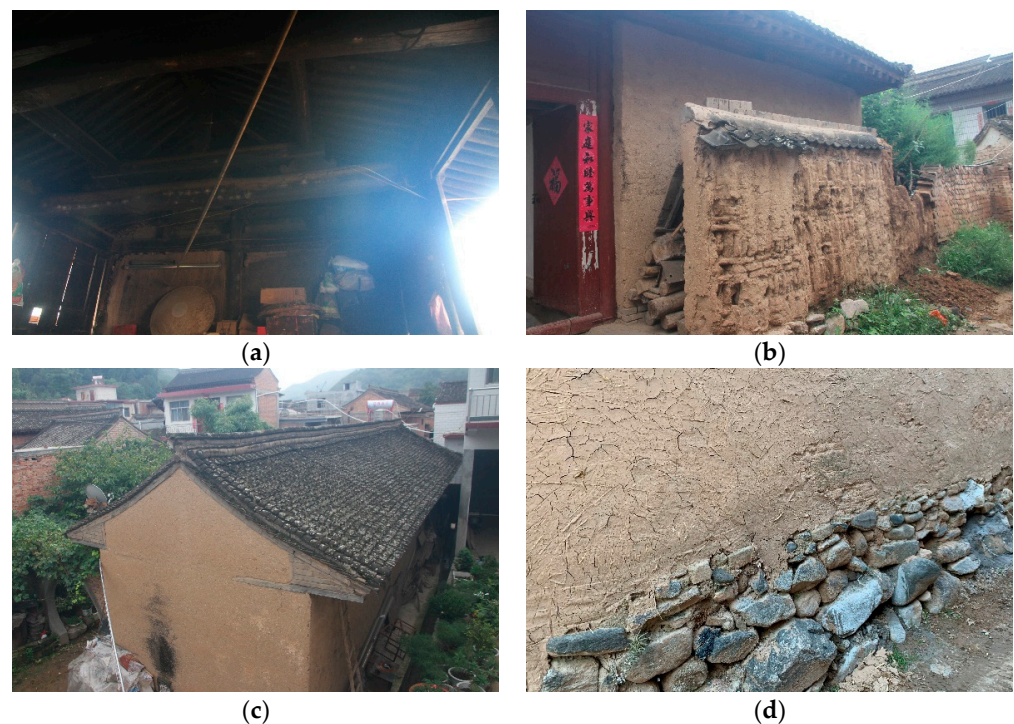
Structure and envelope enclosure of traditional Tianshui dwellings: (a) structure; (b) wall; (c) roof; and (d) foundation.
